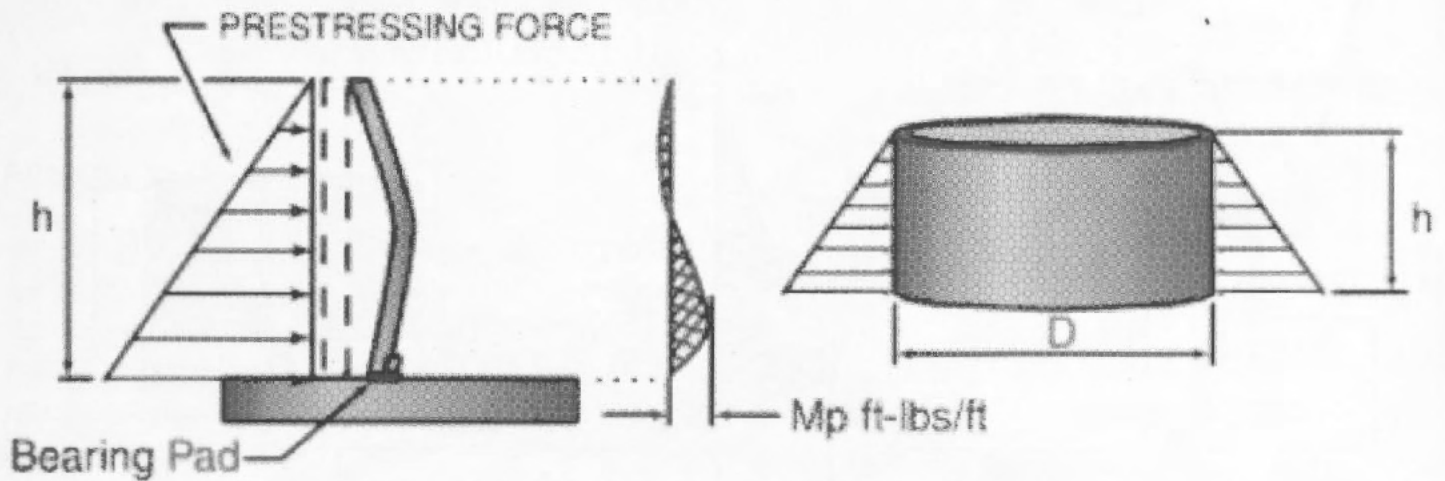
shows similar stages for a circular prestressed concrete tank. The problems mentioned above for a reinforced concrete tanks are alleviated in a spirally wound, prestressed concrete tank explained as follows:
